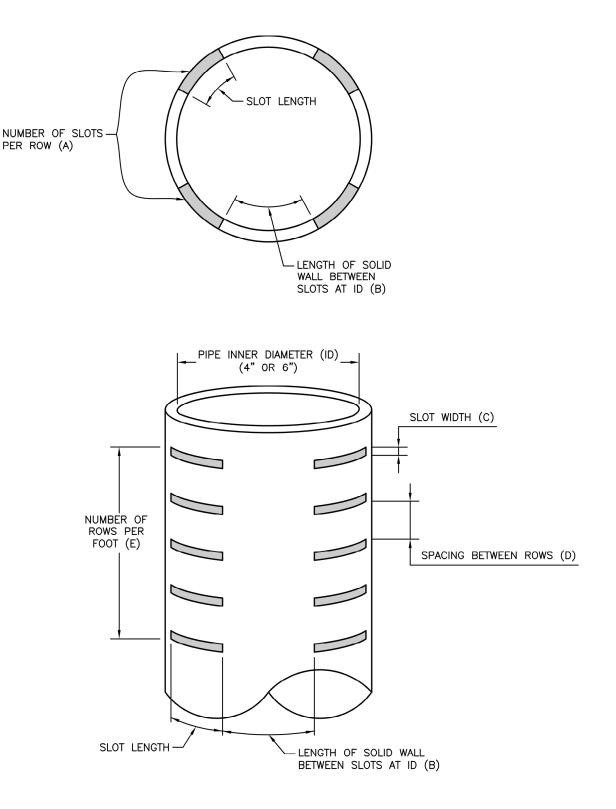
SLOT CONFIGURATION OF PVC UNDERDRAIN PIPE (NOT TO SCALE)
